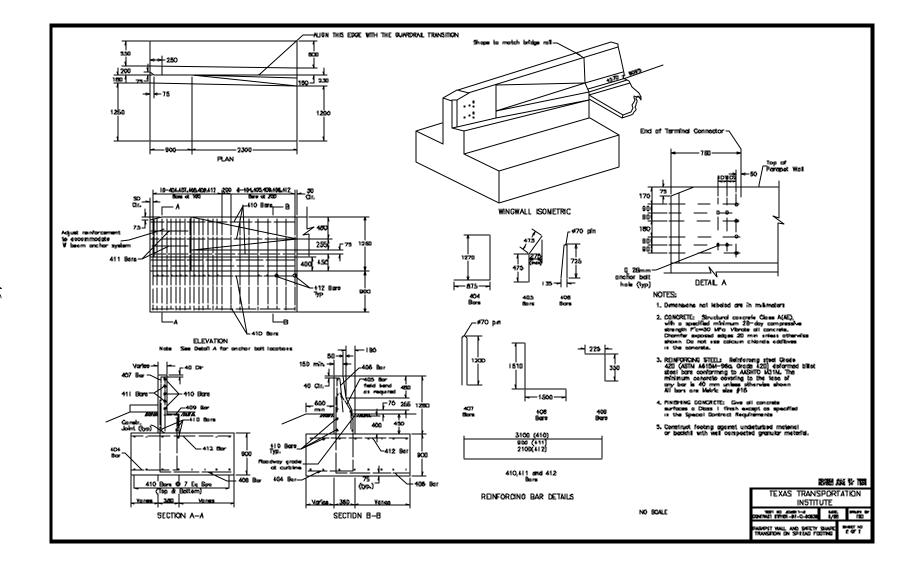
Details of the vertical wall transition installation for test 404211-2.
